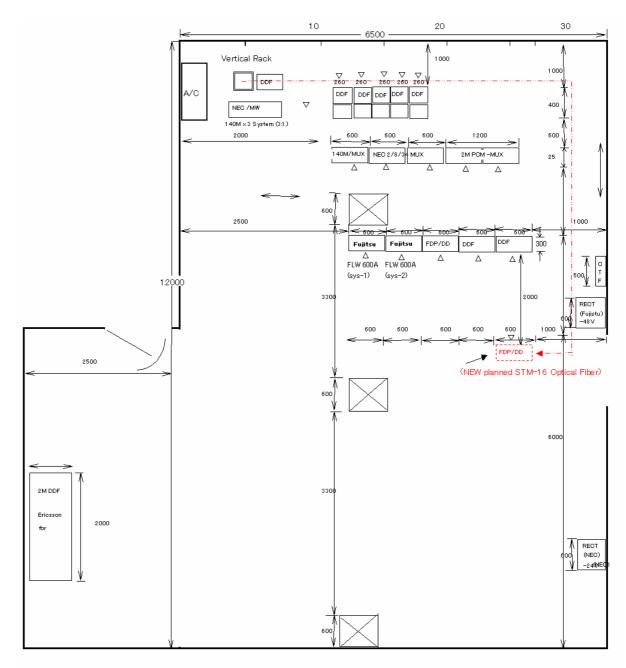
RADIO/MUX ROOM Planned Installation Place (FILWOHA Center)
